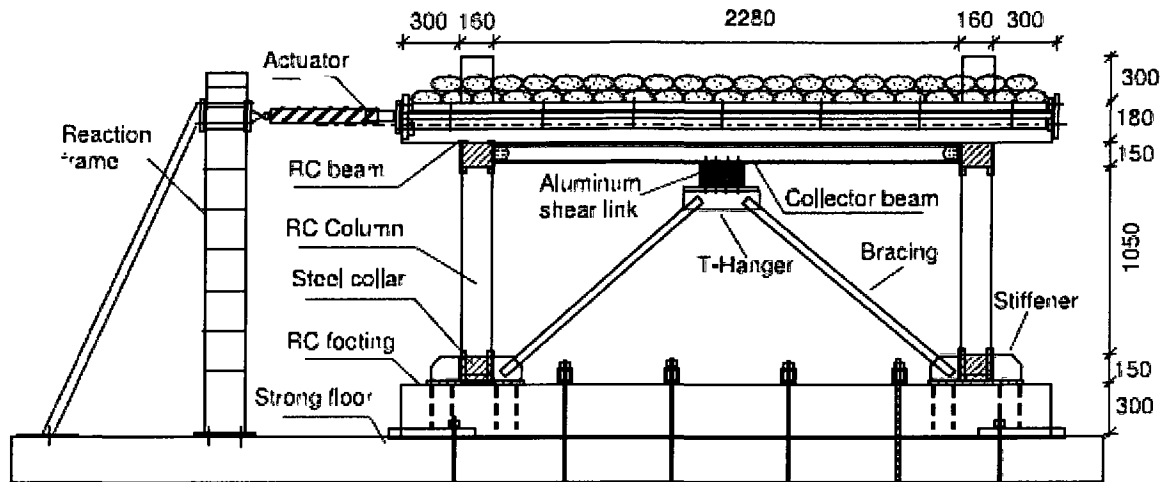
Strengthened specimen (Sahoo and Rai, 2010)
